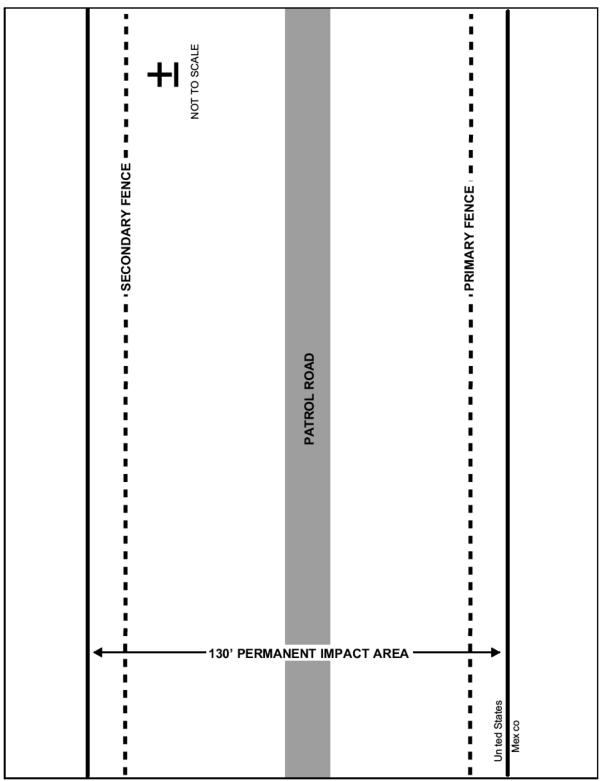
Schematic of Proposed Impact Areas—Alternative 3
